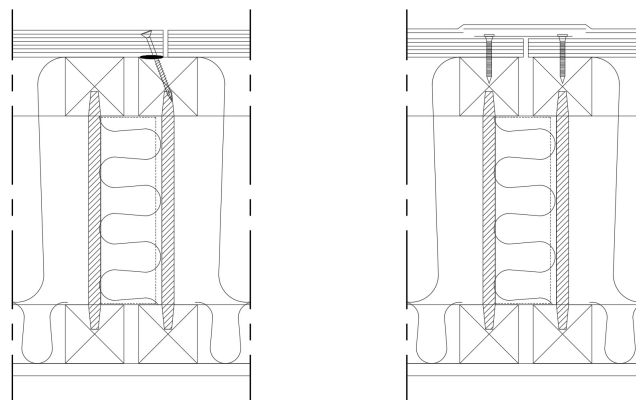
I-Joist longitudinal panel joint.LHS; smaller cantilever of the sheathing panel that is screwed to the adjacent I-joist. RHS; steel plate on top of the sheathing material that is screwed to both adjacent I-joist panels.
